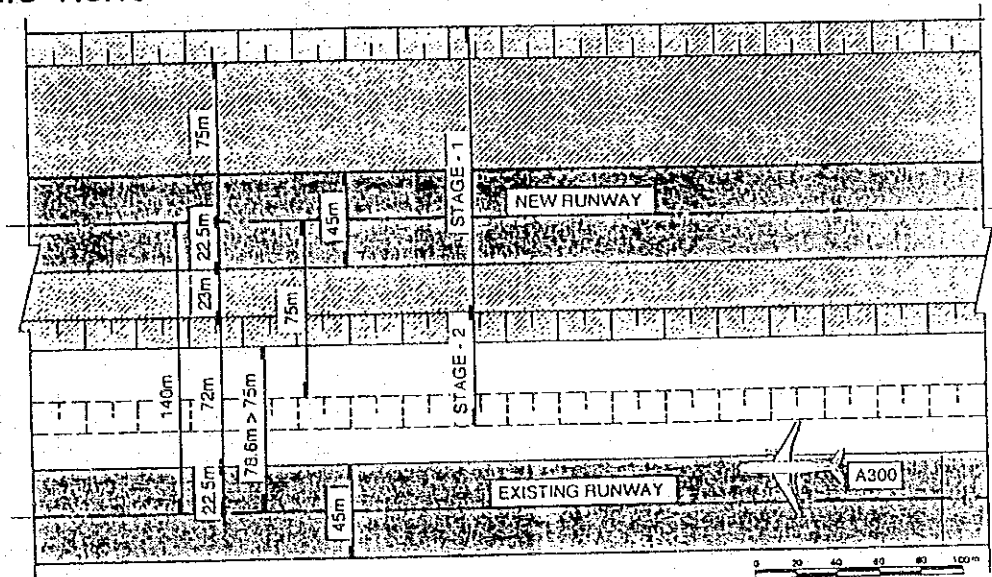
Plan of Embankment (Runway Separation of 140m)
